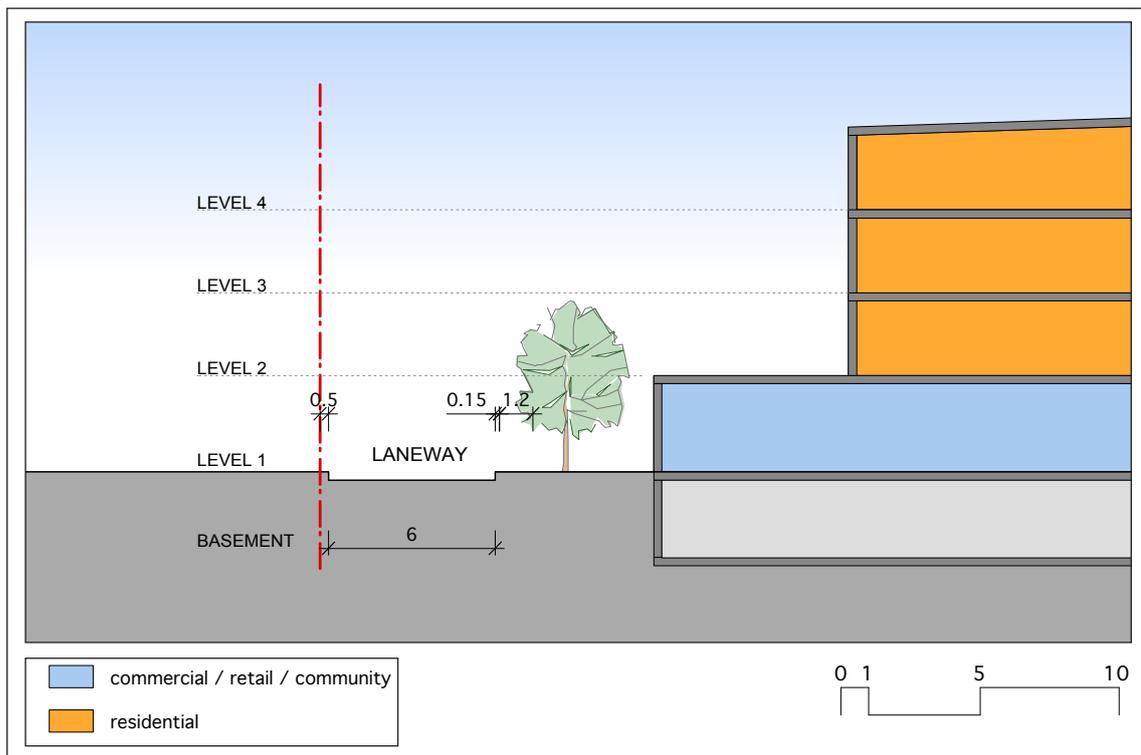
Blenheim Road Small Centre Laneway Section.
